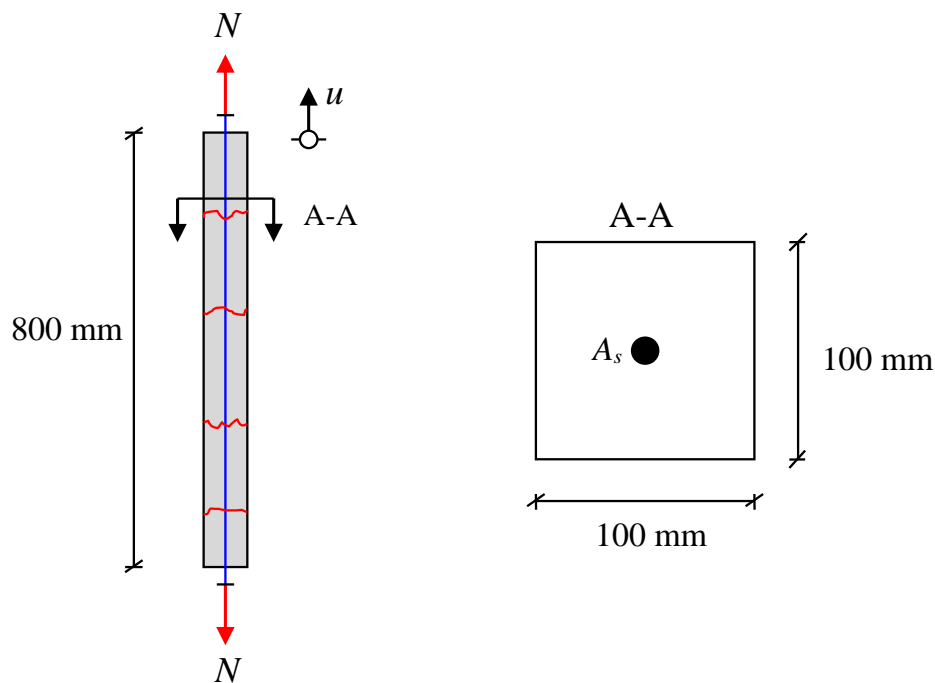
Reinforced concrete prism geometry and cross-section.
